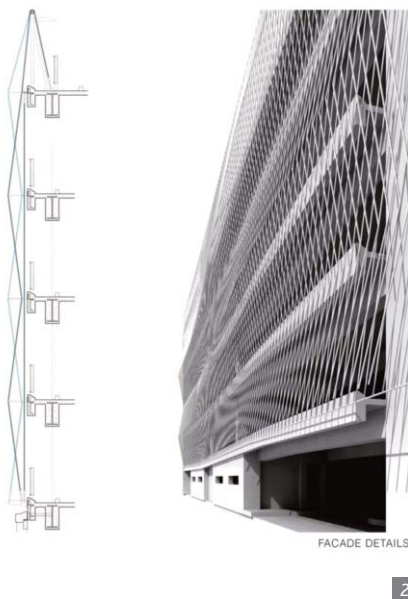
The cable façade x-section showing the cable termination and intermediate floor O-ring connections © Phillystran
